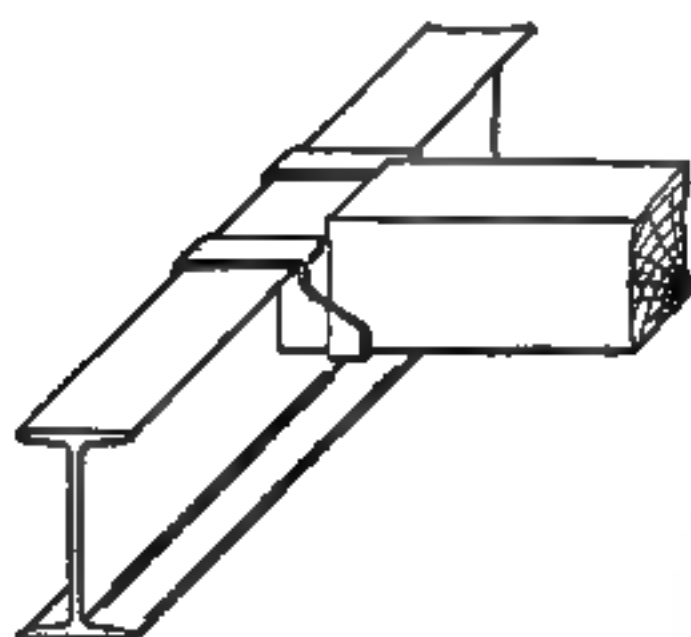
Wooden Beam Framed to I Beam with Stirrup-hanger
